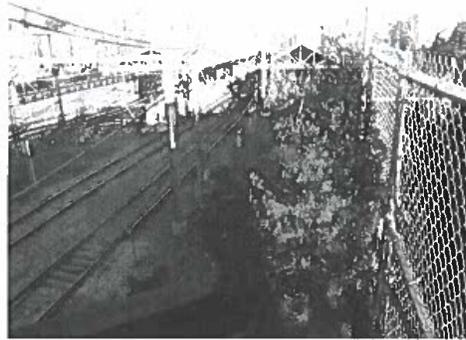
Looking North towards Orient Heights Bridge Station from the Saratoga Street Bridge.
